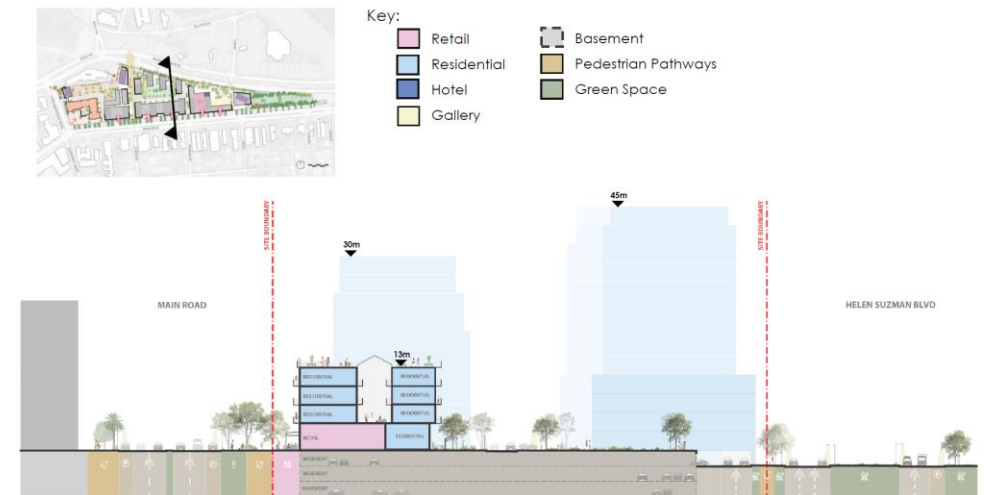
Guidelines for the interface of built form with public places (Source: ACG Architects, 2026)
